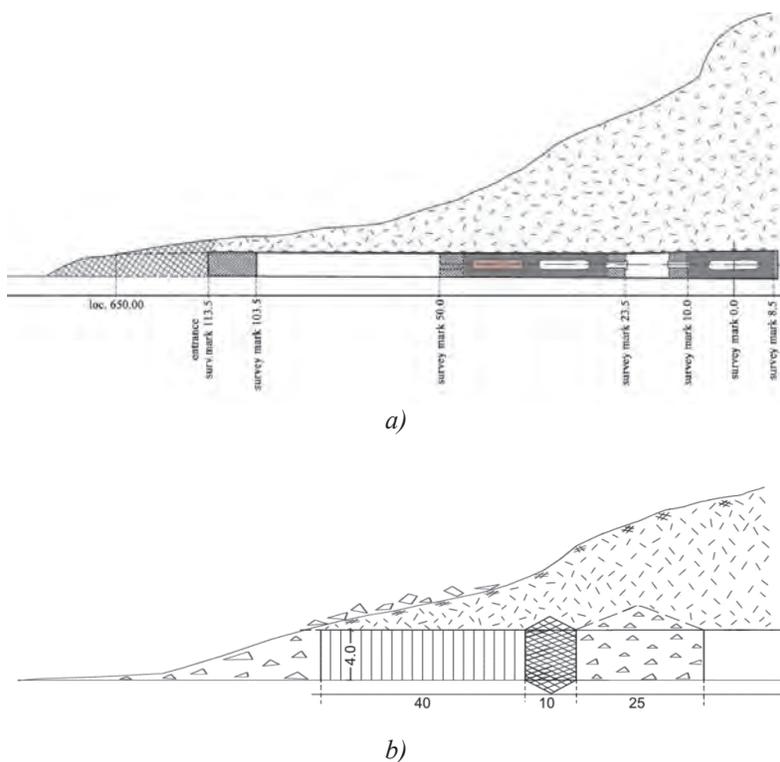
Arrangement for strengthening the left (a) and right (b) engineering structures
